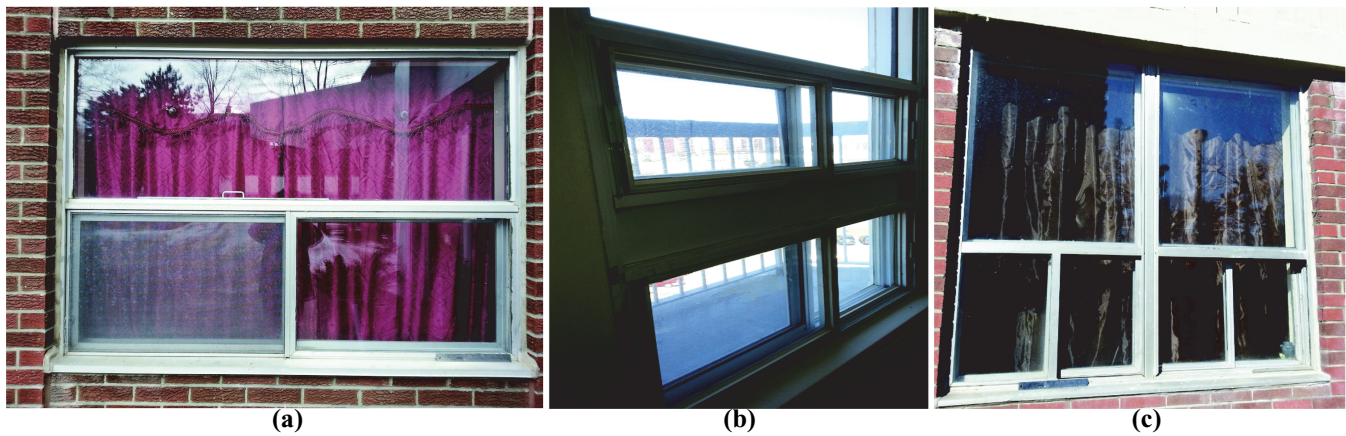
Typical window configurations at (a) Buildings A–B, (b) Buildings C–E, and (c) Buildings F–G.
